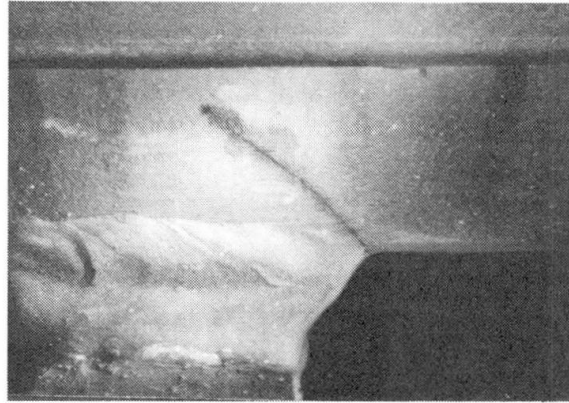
Typical crack in the centerbeam at the full-penetration weld connection.
